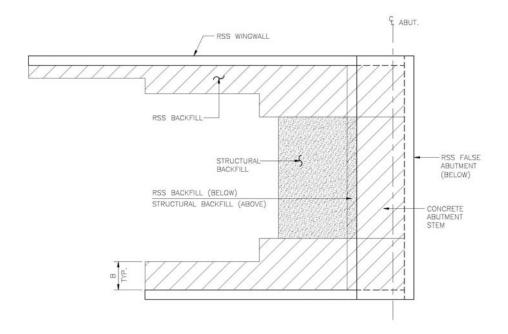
Backfill for RSS False Abutment with RSS Wingwalls (B=0.8H).
